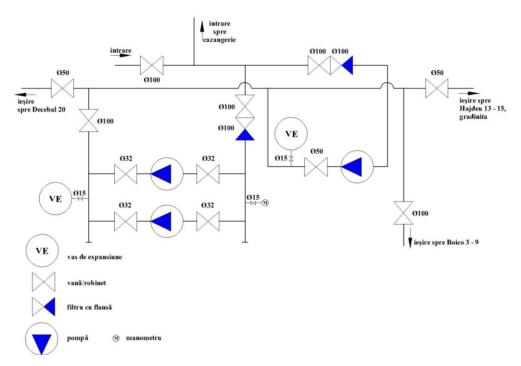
Hydraulic Scheme with existing equipment of BPS-8 – Boico 5-7
